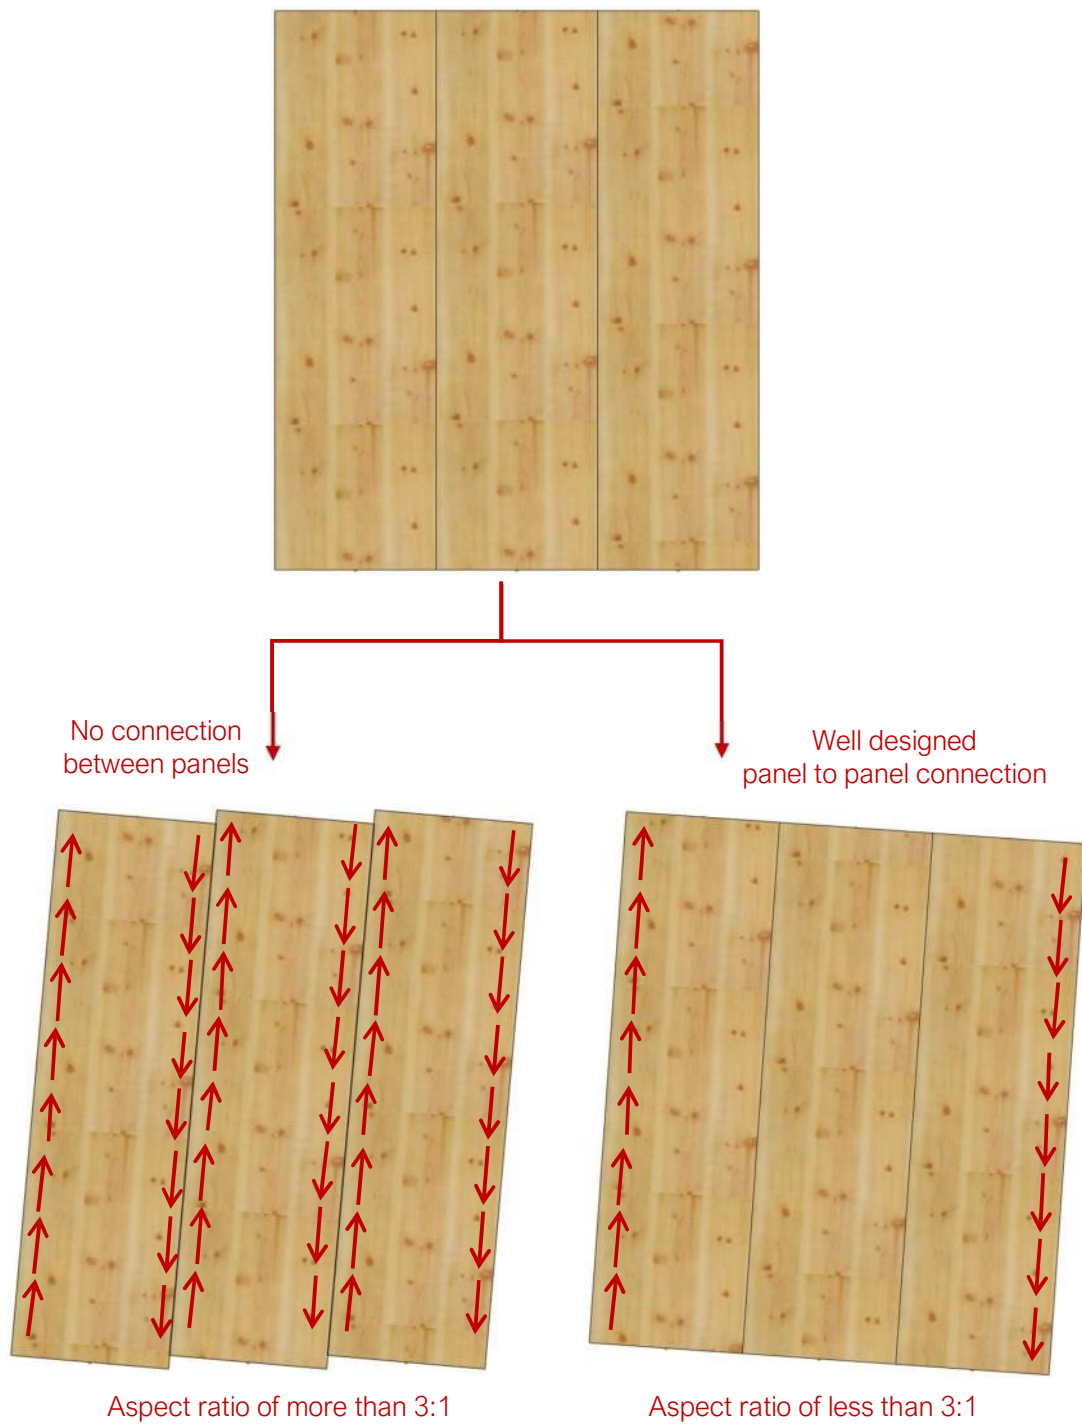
Illustration of rocking behaviour of individual shear wall panels and a well connect CLT shear wall system.
